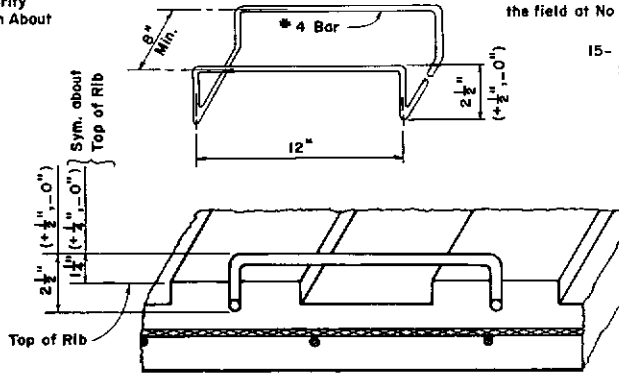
DETAIL RIBBED-PRECAST PRESTRESSED PANELS - RECTANGULAR
